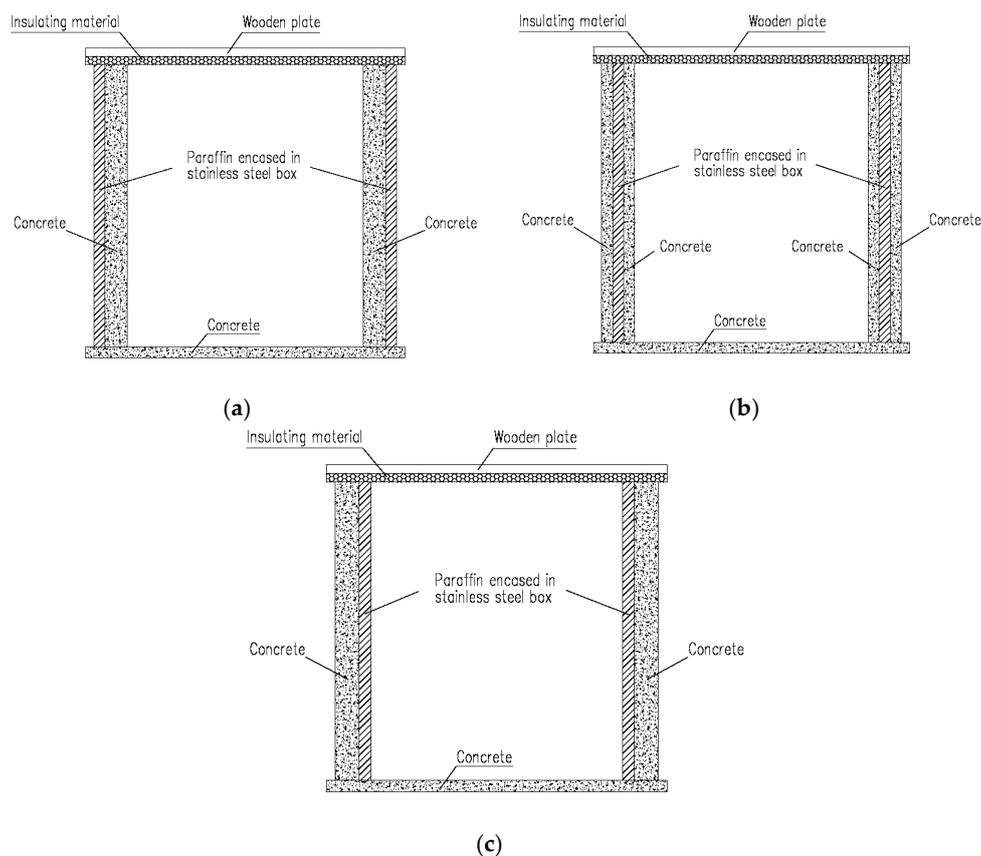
Room model (a) Externally bond with concrete wall (Type I); (b) Laminated within concrete wall (Type II) and (c) Internally bonded with concrete wall (Type III).
